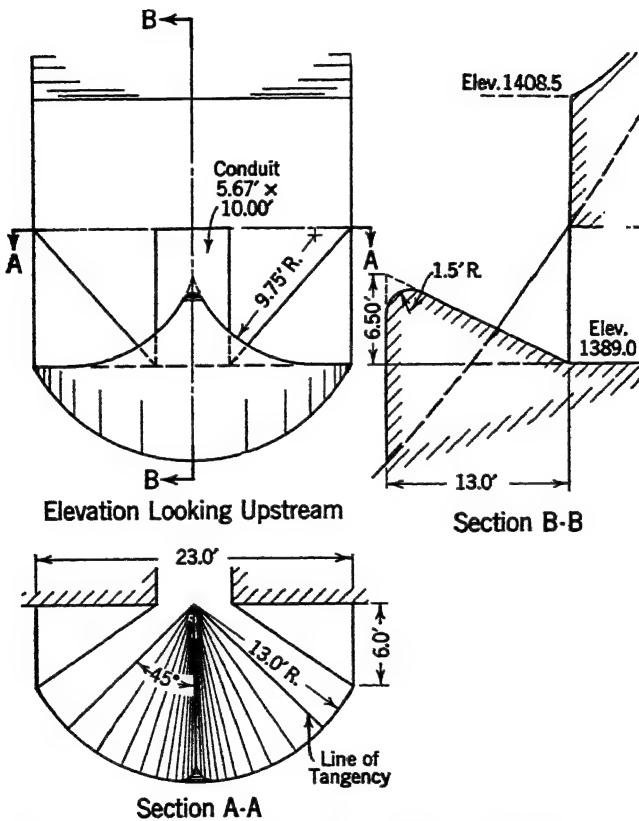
Jet deflector for outlet conduits of the proposed Bluestone Dam.
